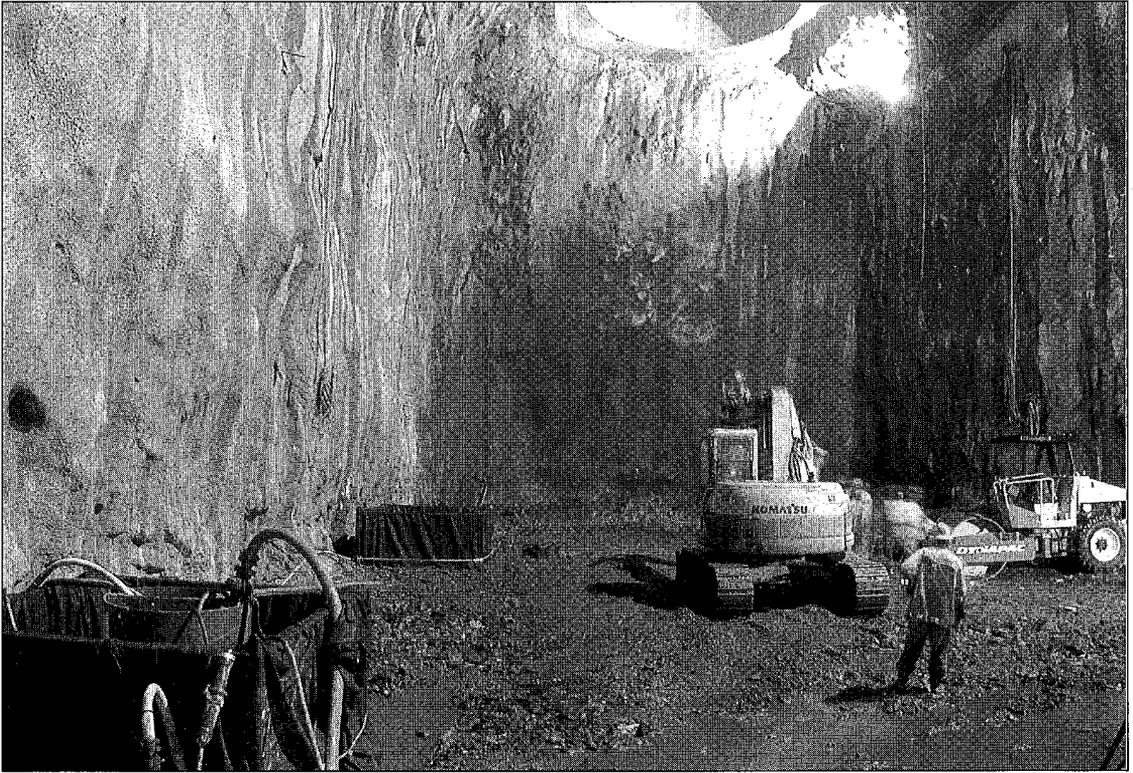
The pump cavern viewed from the portal of suction tunnel, fully excavated to invert, with the utility shaft visible in the upper background.
